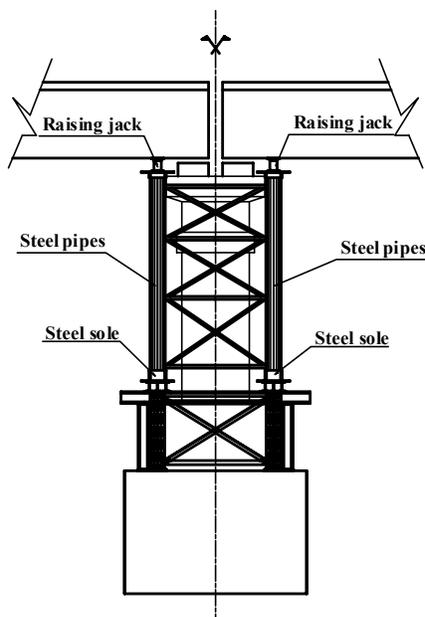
Bridge beam raising solutions by force resistance steel pipes.
